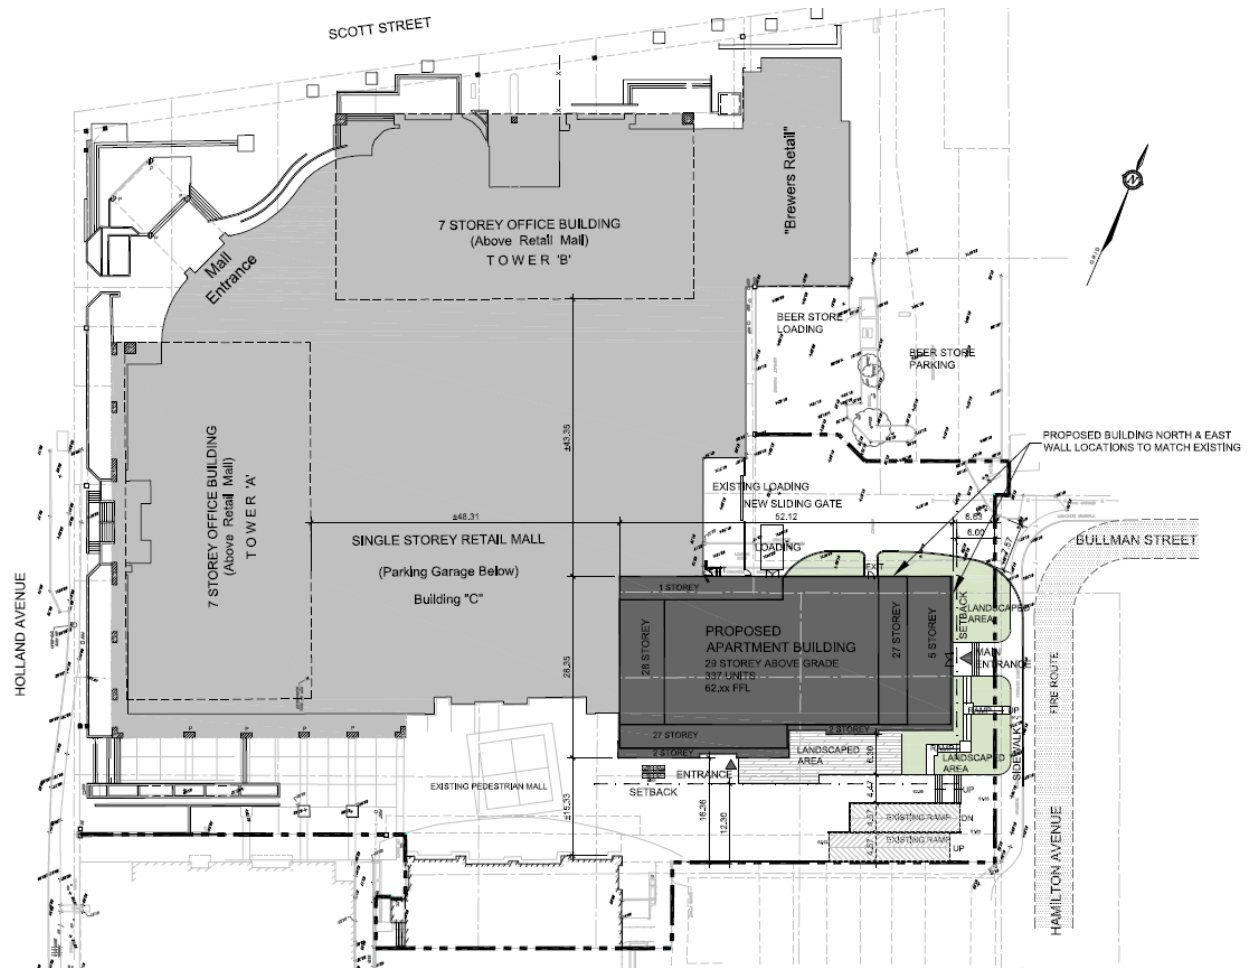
EXCERPT OF CONCEPT SITE PLAN (N45 ARCHITECTURE INC.)
